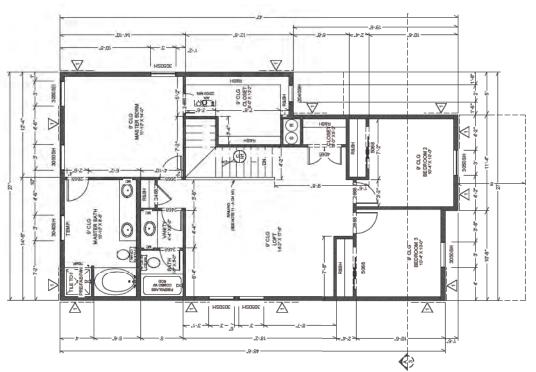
FLOOR PLANS & ELEVATIONS
